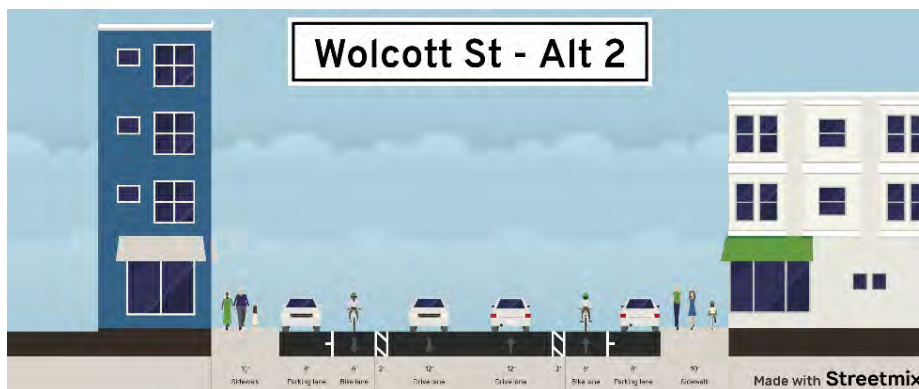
WOLCOTT ST ALTERNATIVE 2 PROPOSED CROSS SECTION
